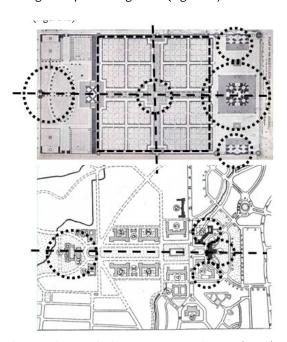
Site Plan of Taj Mahal 'Mughal Architecture' (Upper) and Gedung Sate (below) are similar but different in their garden arrangement. [30][16]
